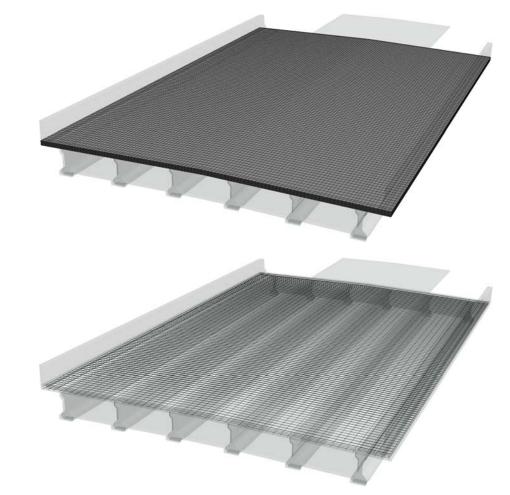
FE model of the bridge slab: a) concrete, b) detailed reinforcement
